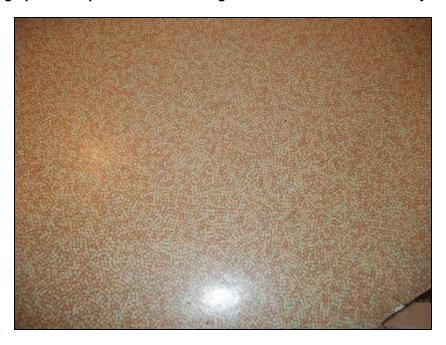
Sample CT-6. The flooring was found to contain 20% Chrysotile asbestos.
